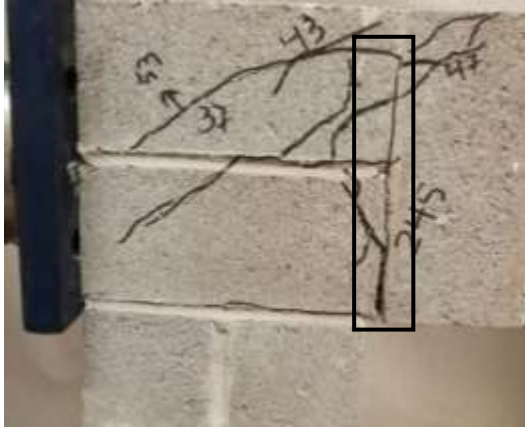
Final Crack Pattern of the Masonry Bare Frame
